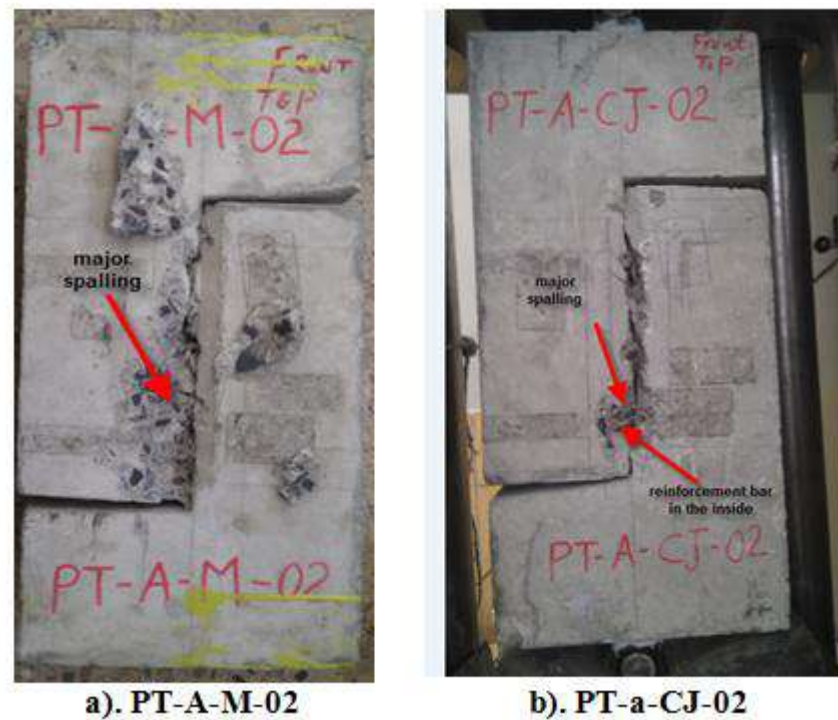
7: Major spalling for samples in which the confinement bars were placed in the inside
